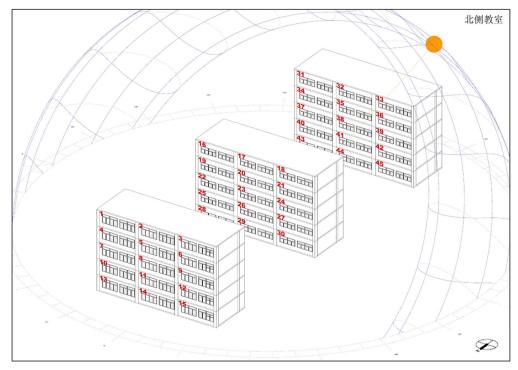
Connection Methods and Orientation Layout of Classroom Buildings
